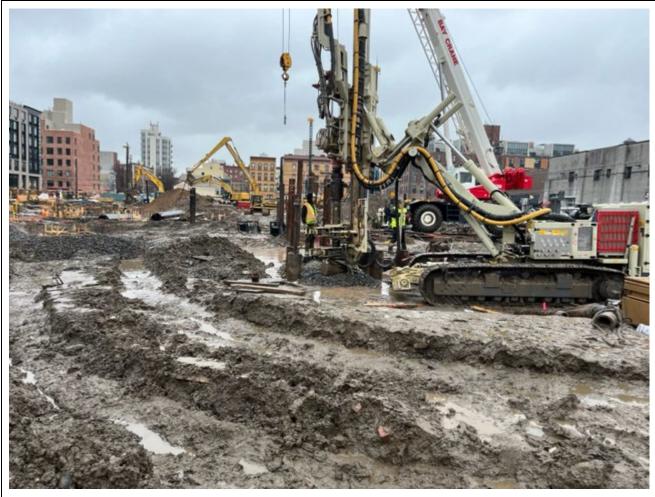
View facing southeast, CCJV loading up concrete to be exported offsite.
